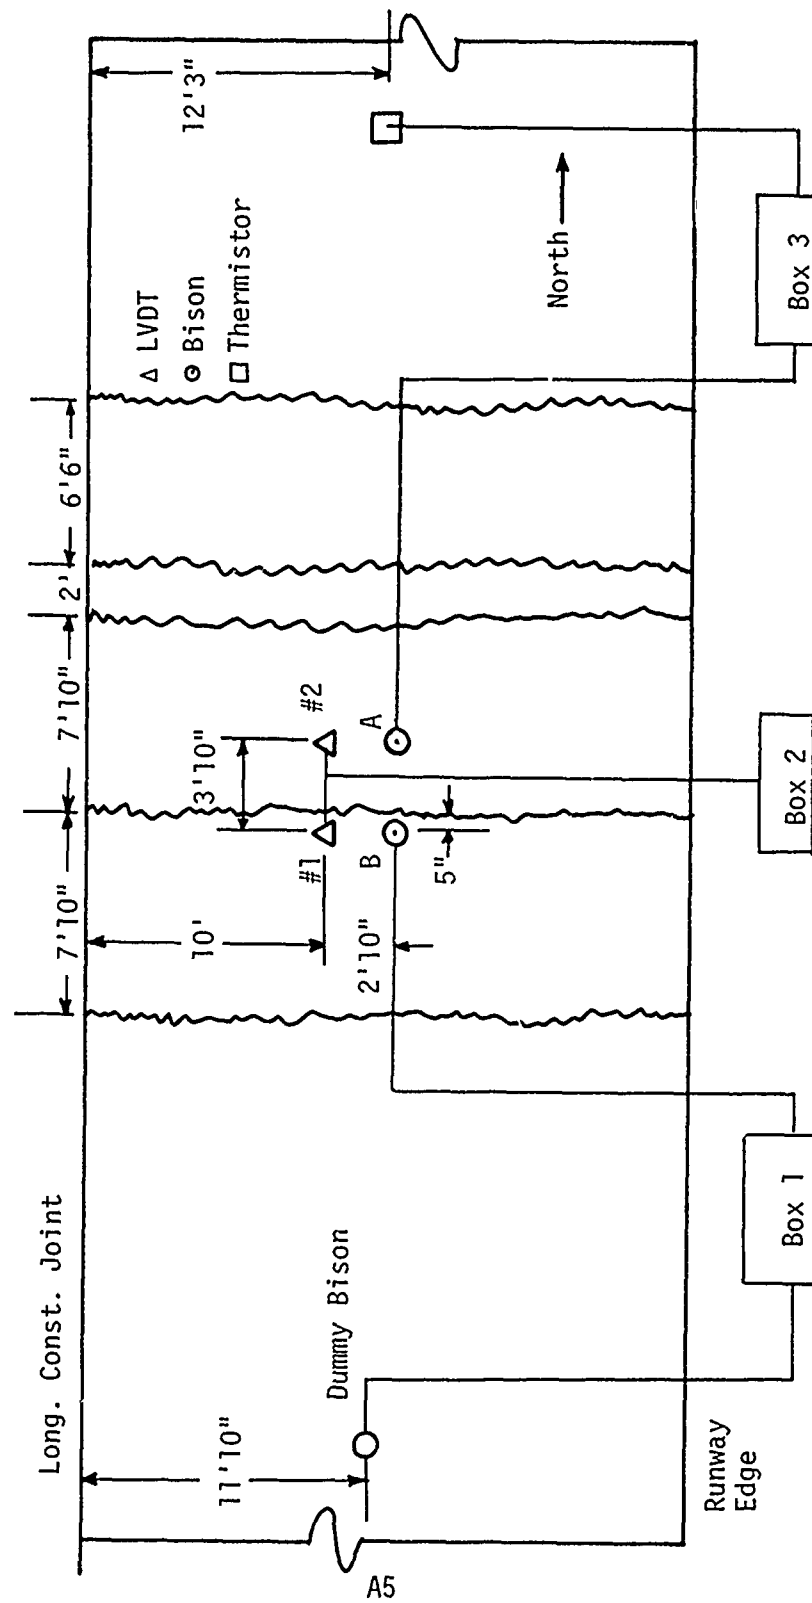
Site 4 - Station 305 + 77, No traffic, outer paving lane, (adjacent to site 3).
